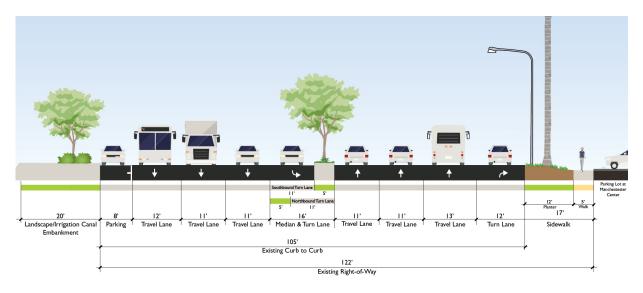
Existing Conditions Cross-section: Dayton Avenue to Shields Avenue (facing North)
